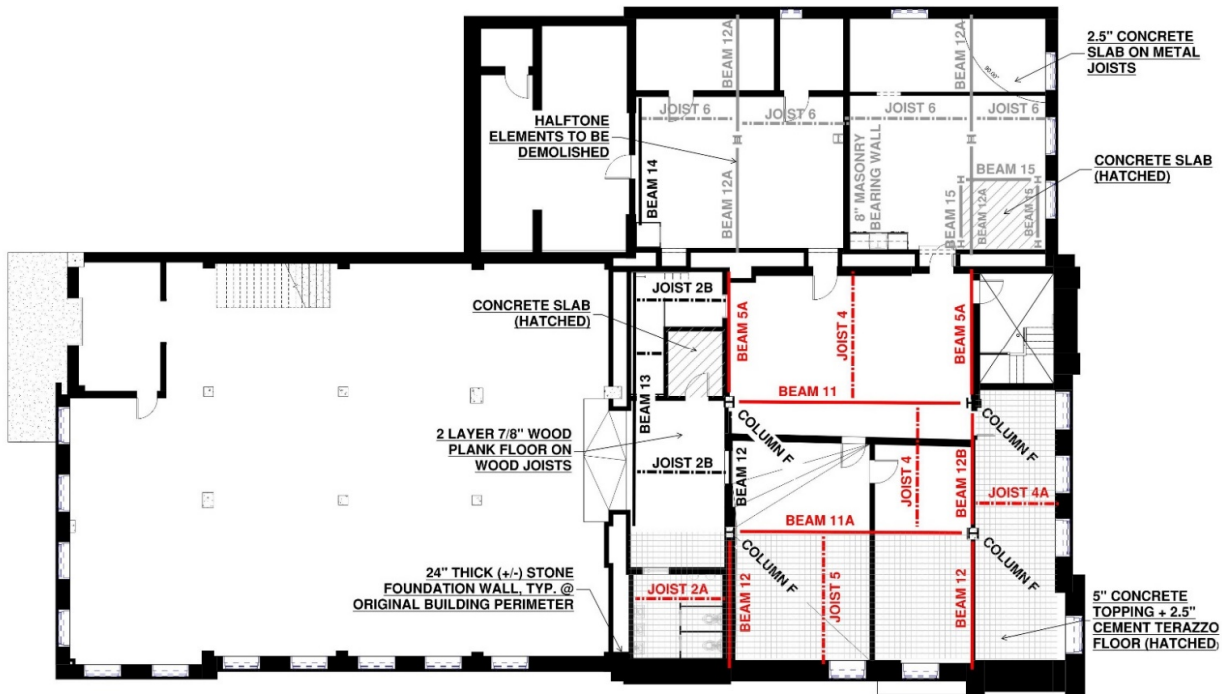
A: Main Floor Framing Plan. Structural elements shown in red require reinforcement, see Figure 4B.
